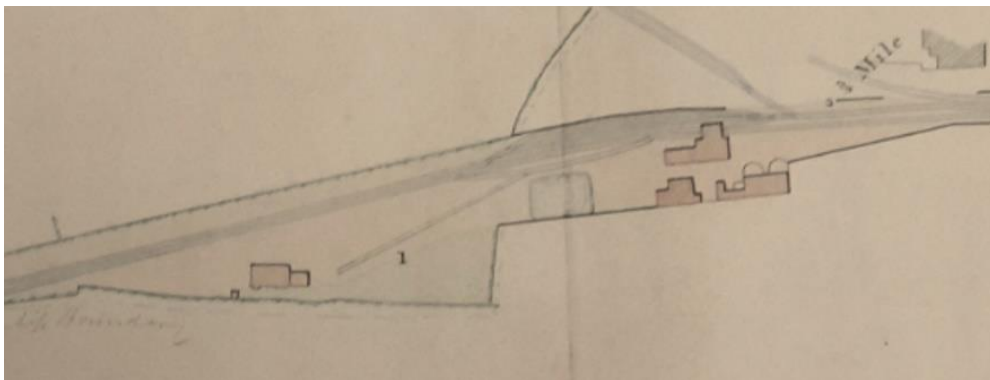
Hollins Hill Farm (on the left) in 1839 with a siding leading to another siding at the engine house reservoir. It was located within S&DR land and appears to be an S&DR building at that time. (TNA RAIL 1037/453, photographed by Maggie Pulle)
